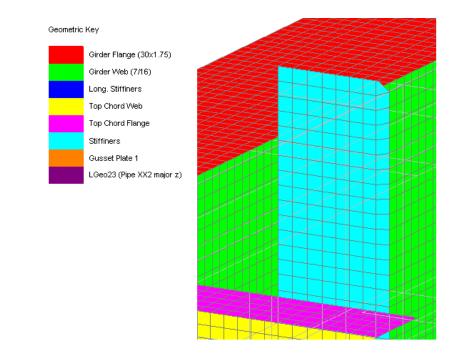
FE Model - Stiffeners Connected to Girder Top Flange
